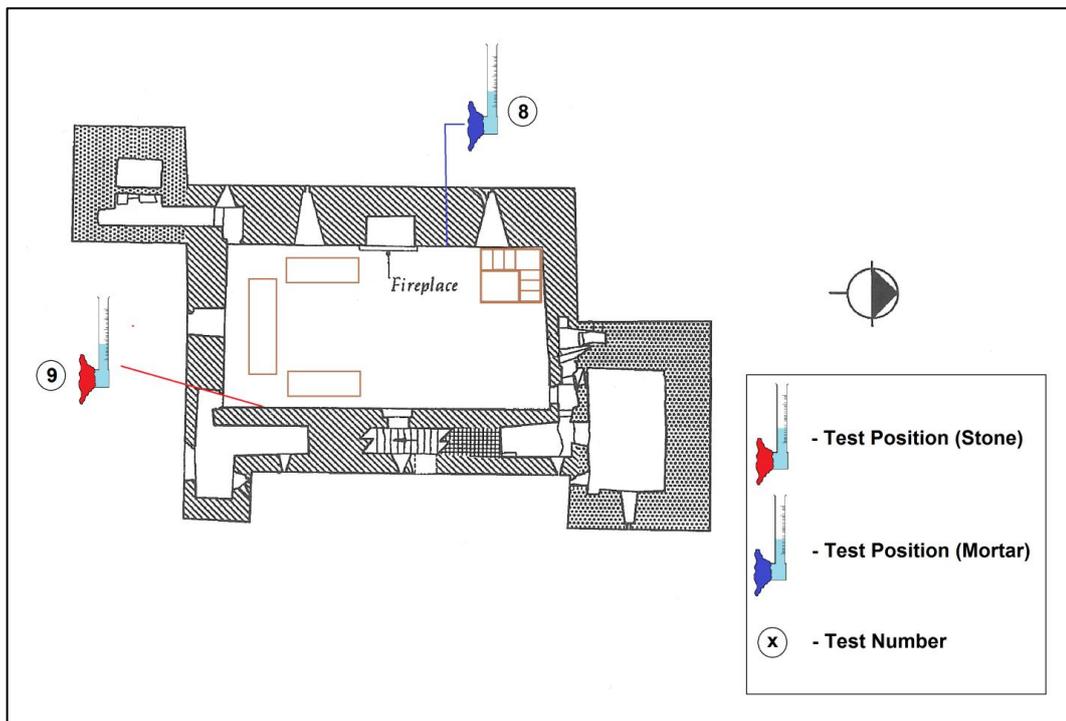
RILEM tube test number and positions on first floor interior wall of Barryscourt
